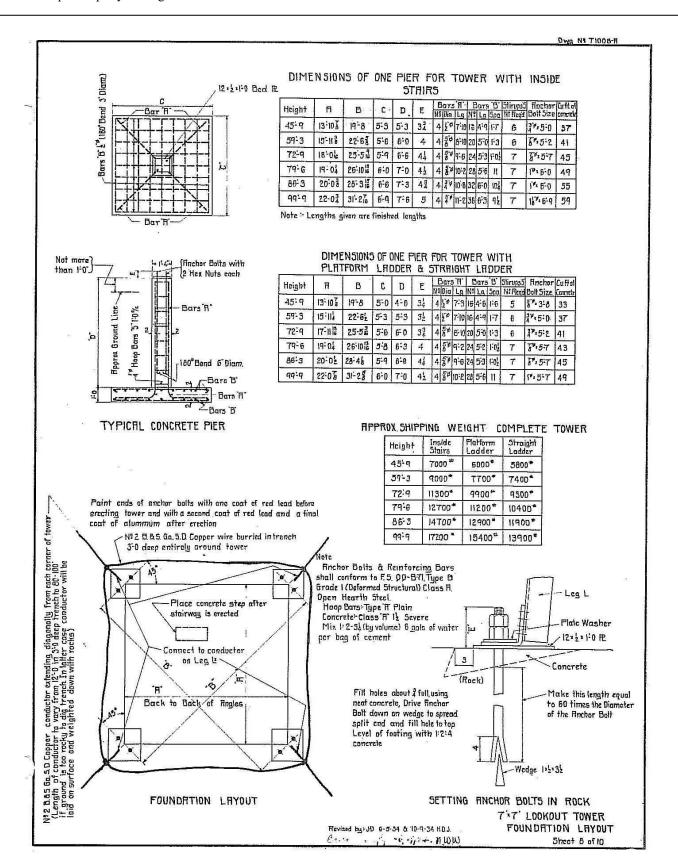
USFS specifications for steel fire lookout tower foundations and concrete footers (Fickes, 1935: 307).
